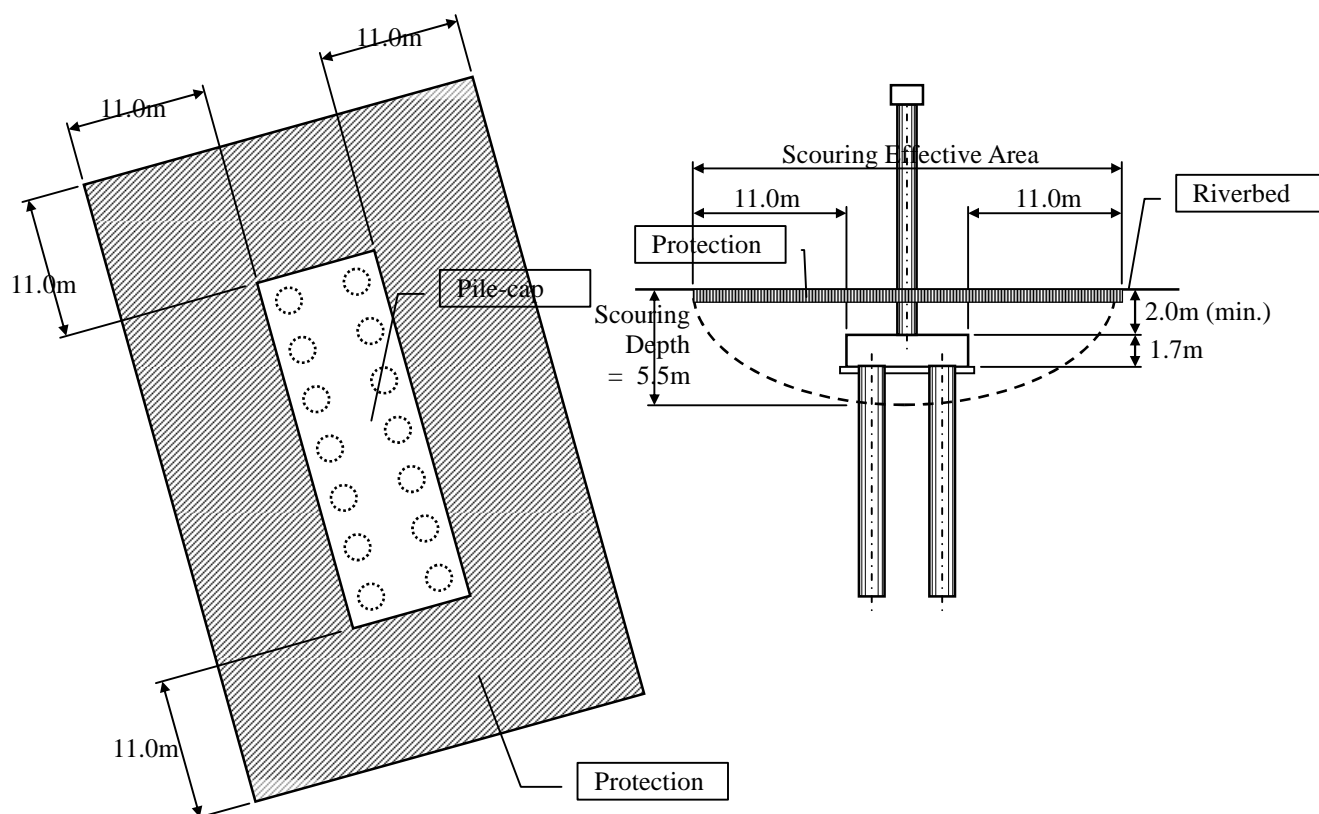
Protection Area for Scouring (Pier-3 to 6)
